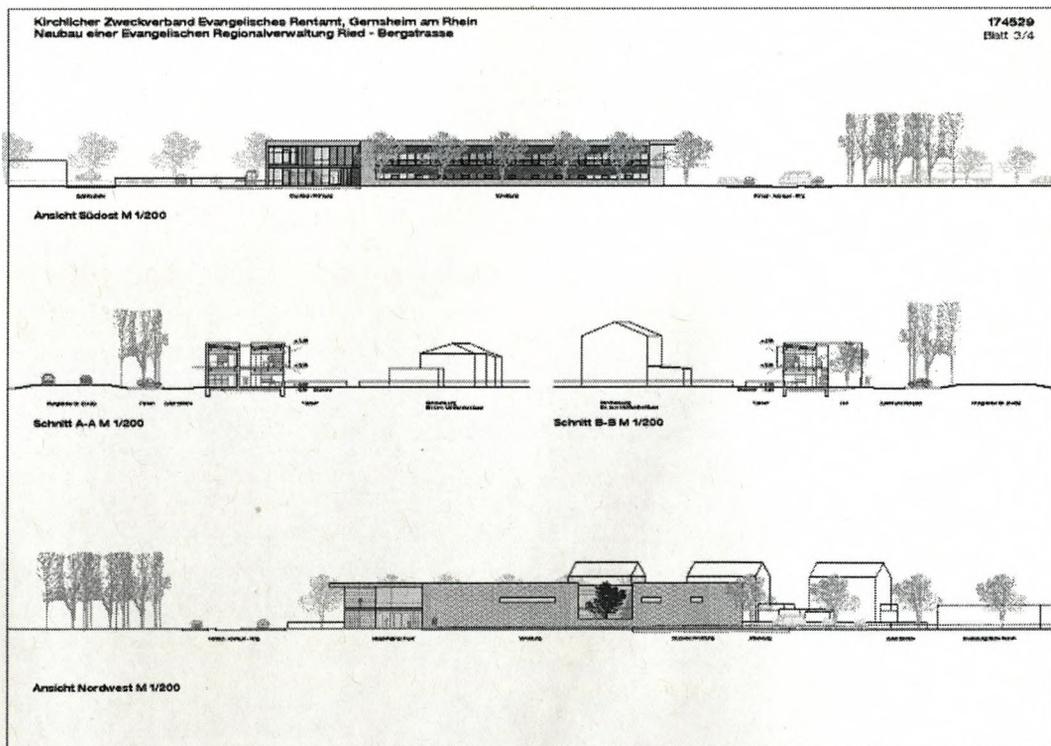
Gernsheim. Competition entry sheet 3. Sections and elevations (not to scale).
